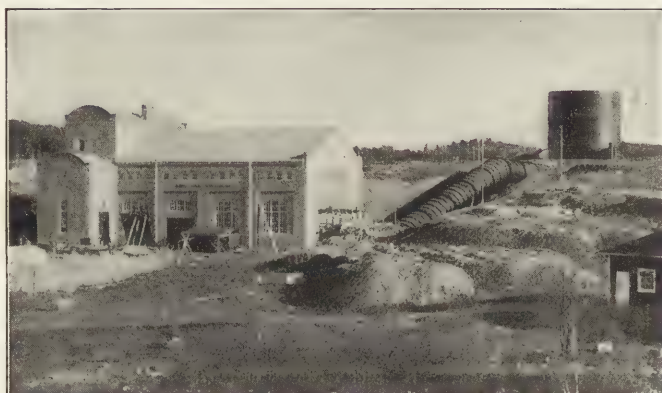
Haby Power House, Pipe Line and Pressure Tower.
